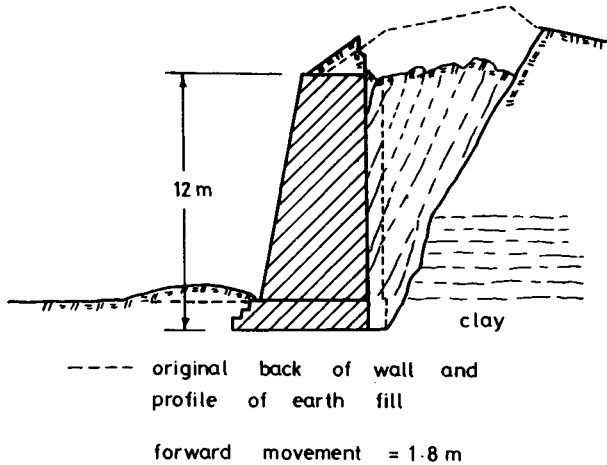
Failure of a retaining wall at Soissons, 1837 (Poncelet, 1840)
